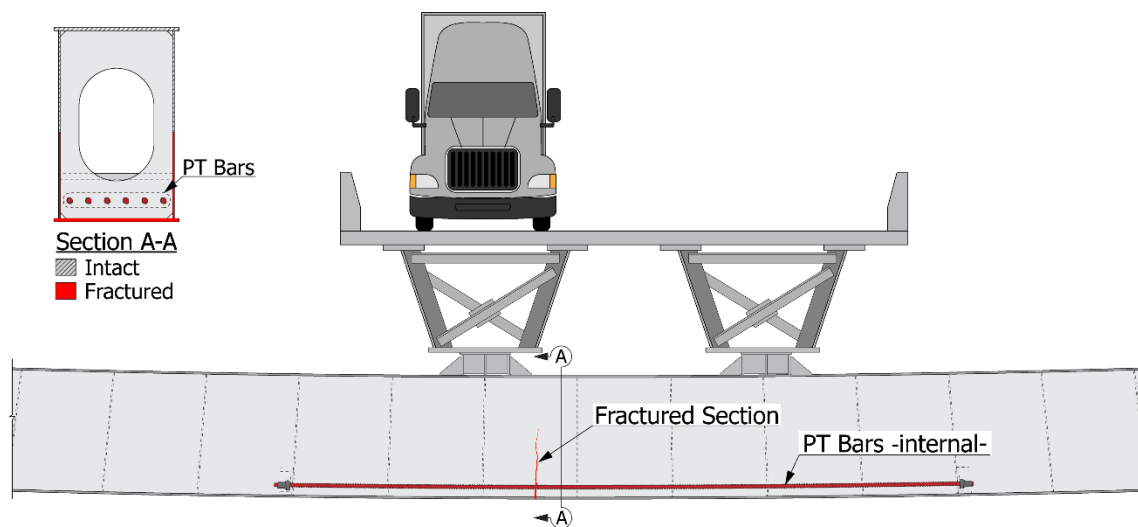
Design Concept A: steel box straddle cap reinforced with PT bars
